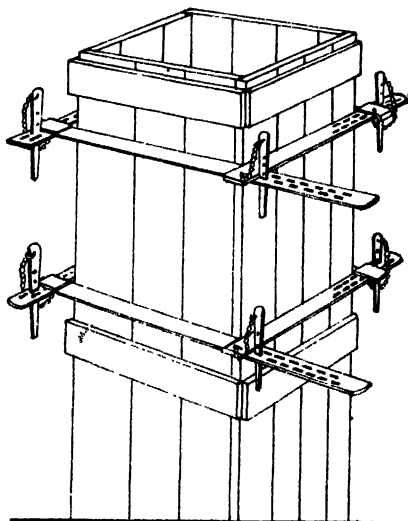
ADJUSTABLE STEEL COLUMN CLAMPS FOR TIMBER SHUTTERING
